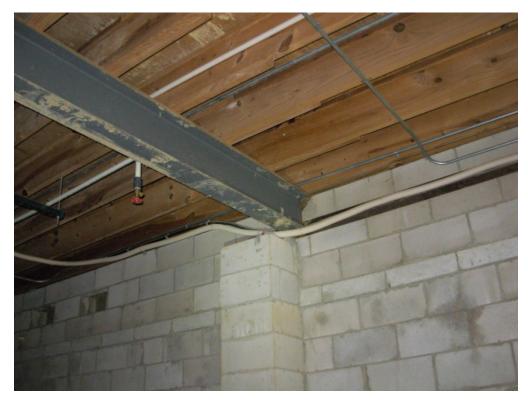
On the west end of the steel girder, the concrete block pilaster was apparently misplaced, so a steel angle was added to support the beam. This condition is not ideal but appears to be working.
